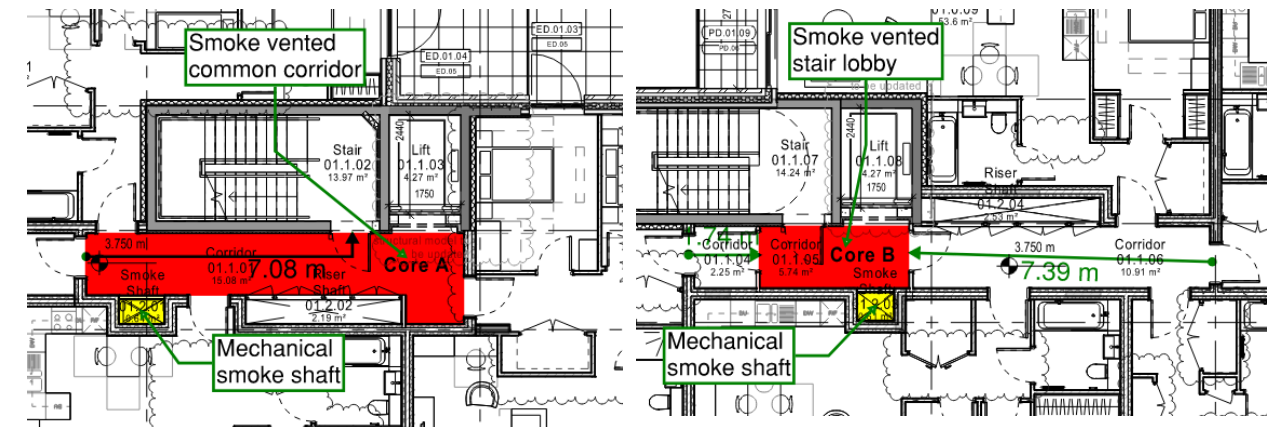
First Floor – Fourth Floor Common Corridor Layout
